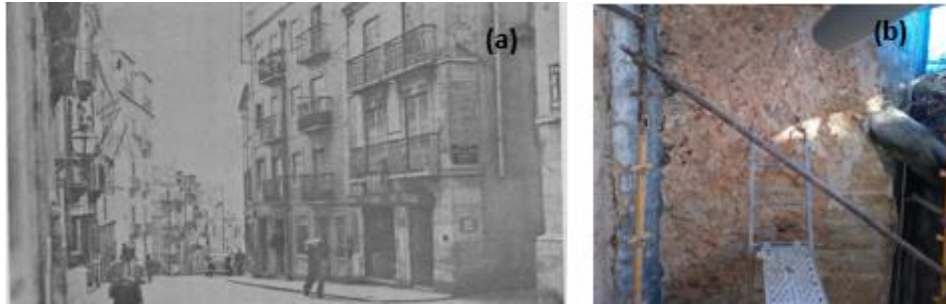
(a) Santana's Street in 1949 [1] and (b) wall masonry of the tower inside the building
